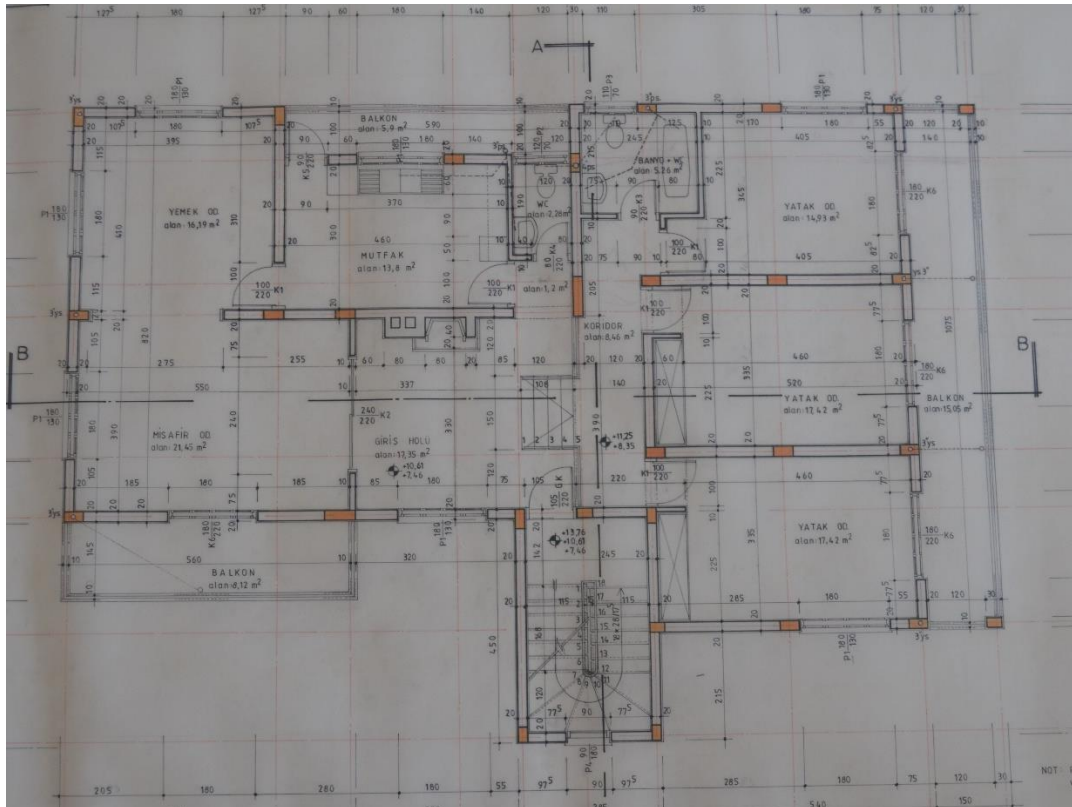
The typical floor plan of Sevim Mehmet Münir House (from Abdullah Onar archive with the permission of Anber Onar)
